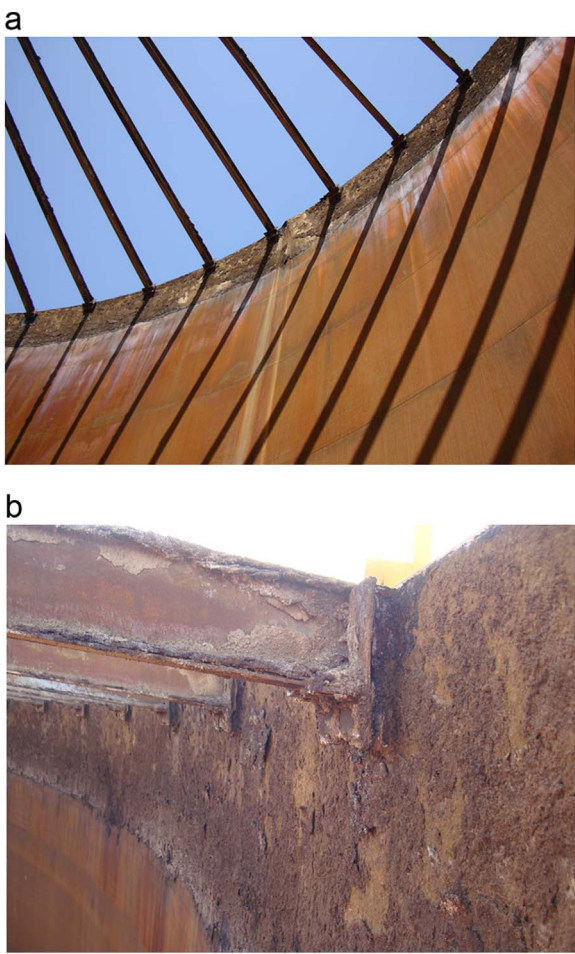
Corrosion of upper course and roof supporting structure of tank TK-2047: (a) roof plate has been removed for renovation purposes and (b) details of roof rafter attachment.
